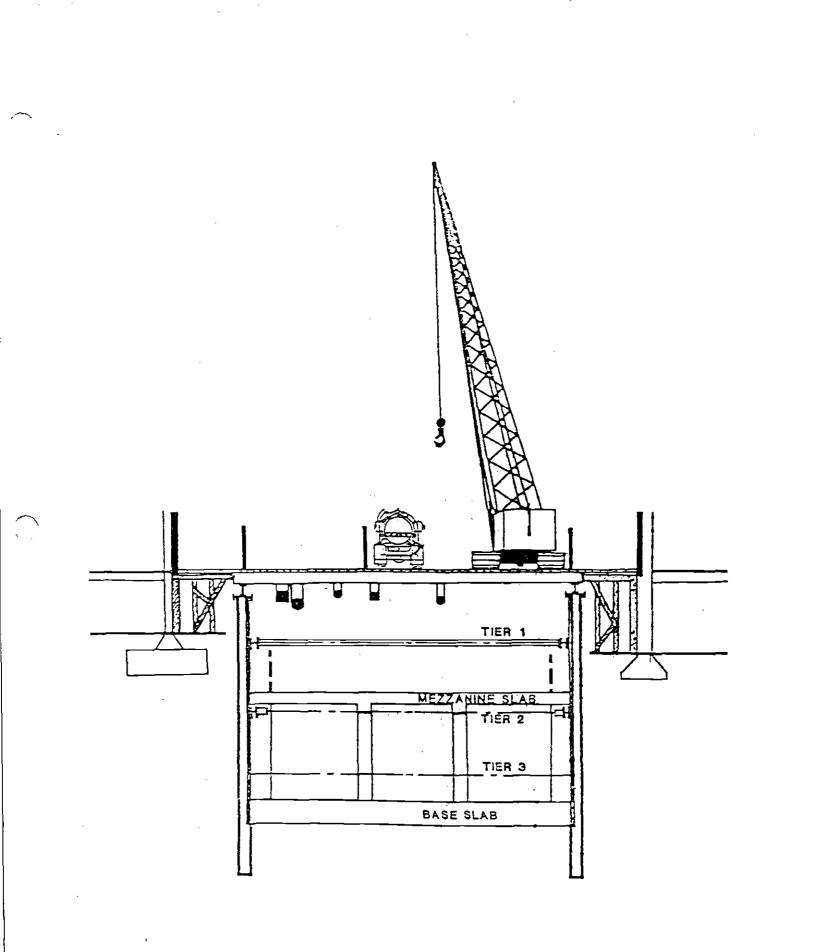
STRUCTURE INSTALLATION AND BRACING AND REMOVAL
